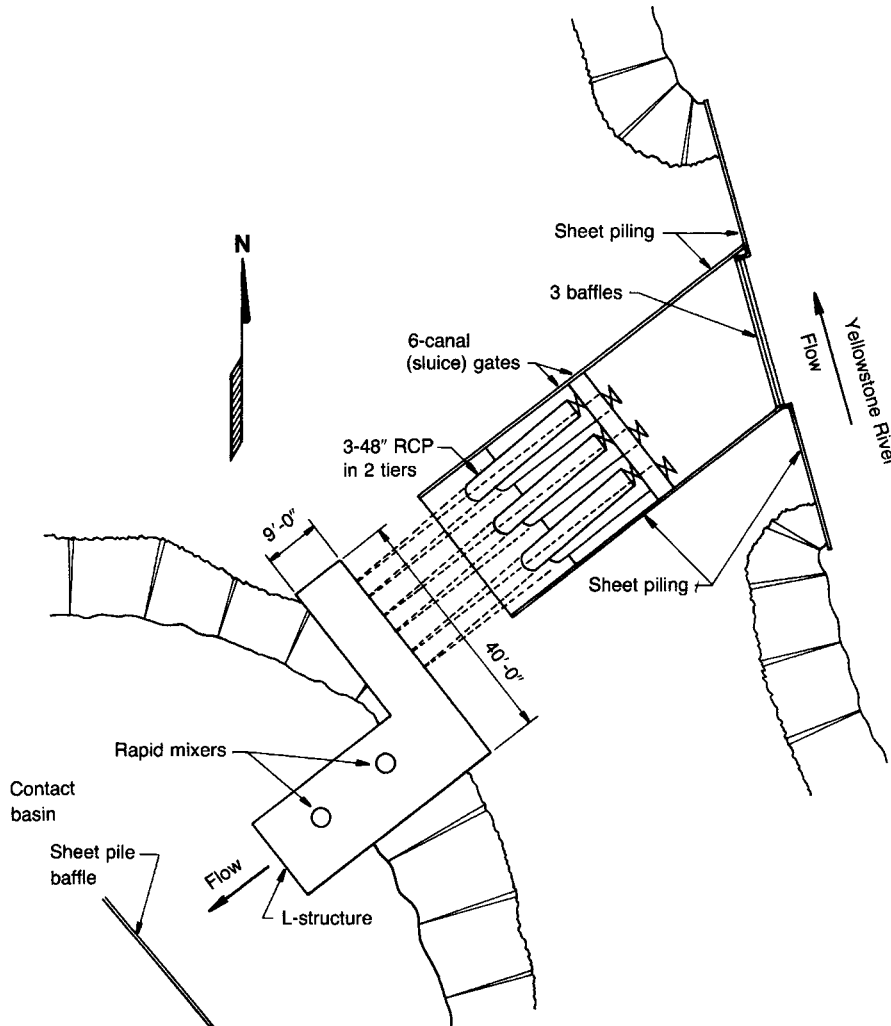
Inlet No. 1 at Billings Water Treatment Plant.
